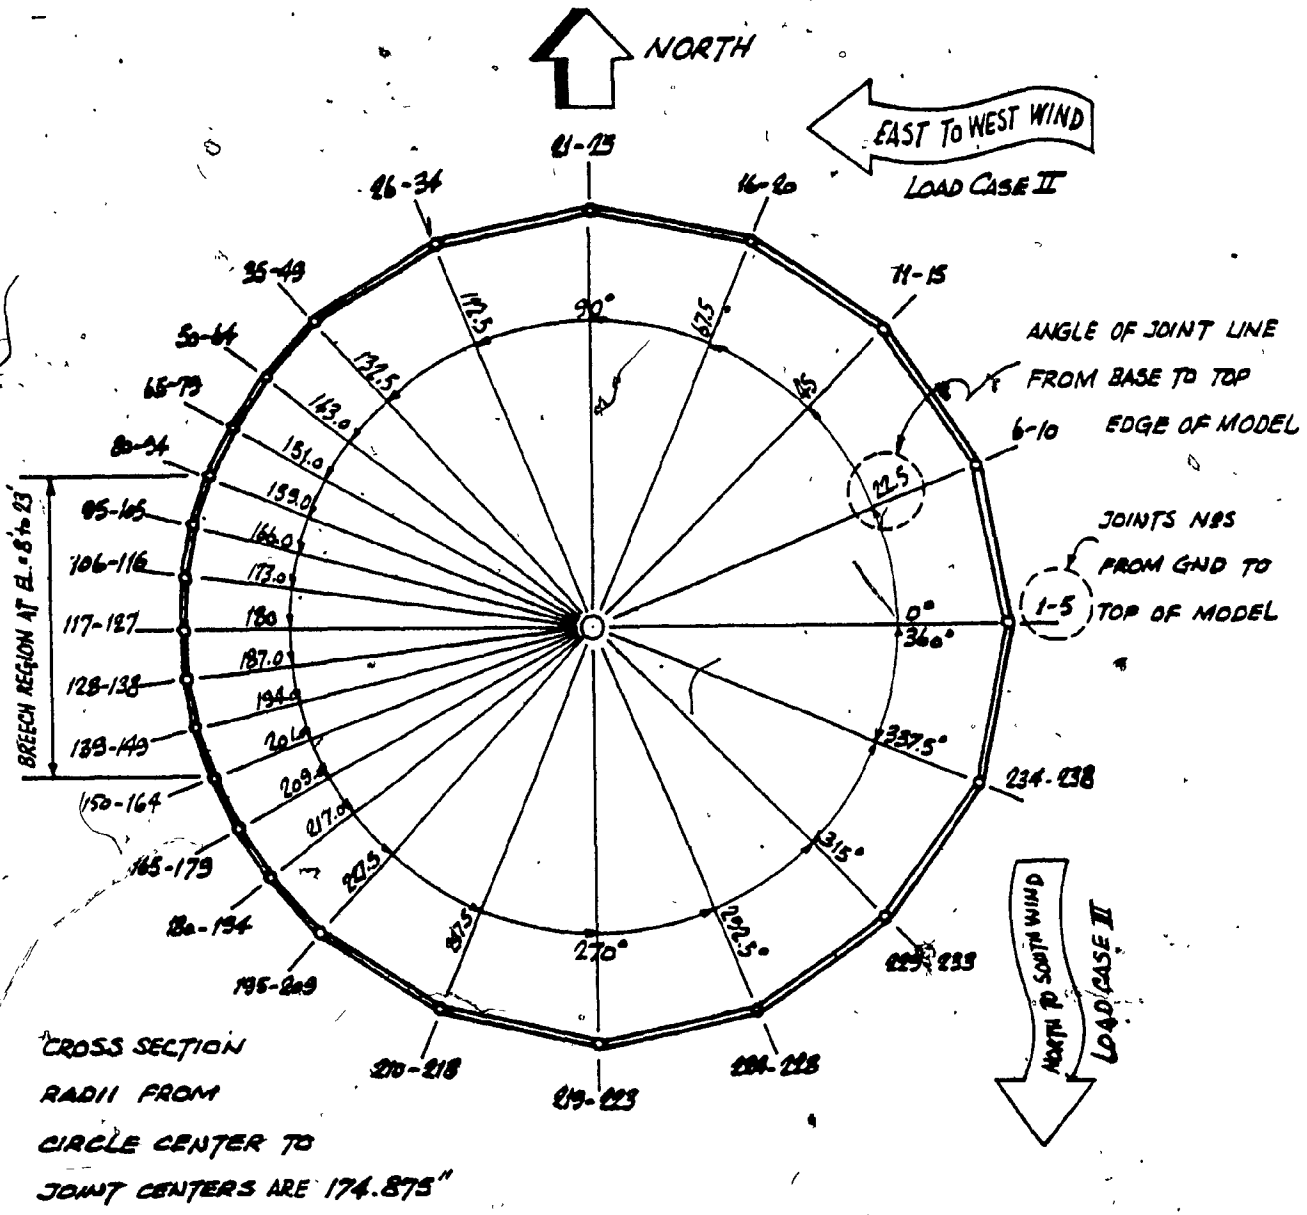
MODEL I, PLAN CROSS SECTION
